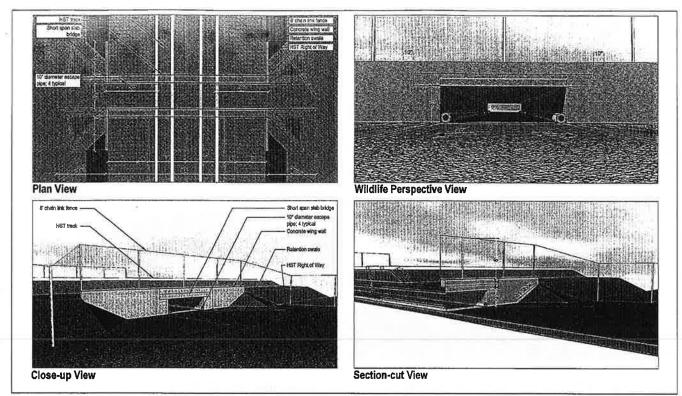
Typical Short-span Slab Bridge Dedicated Wildlife Crossing
